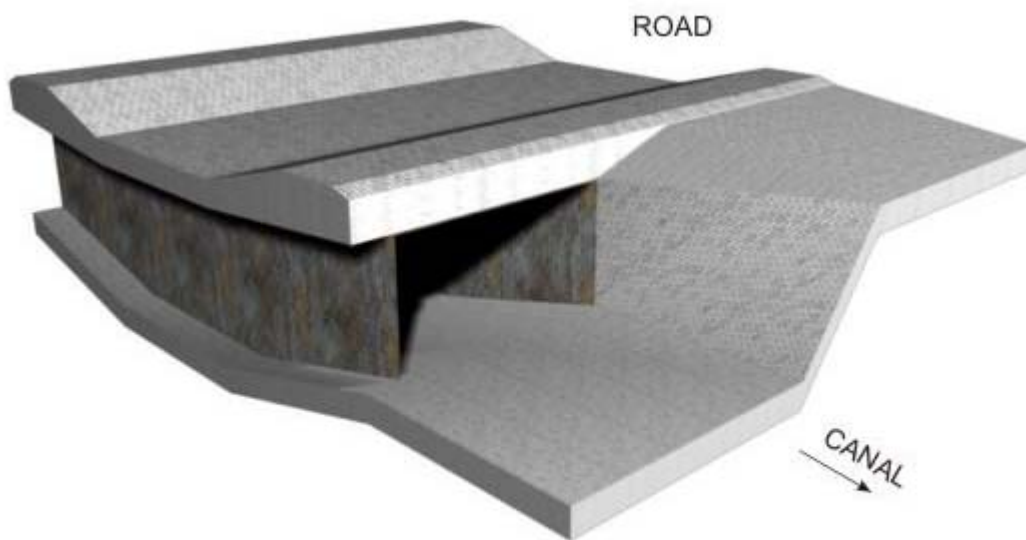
Inverted Syphon below roads showing rectangular section. Circular section also possible
